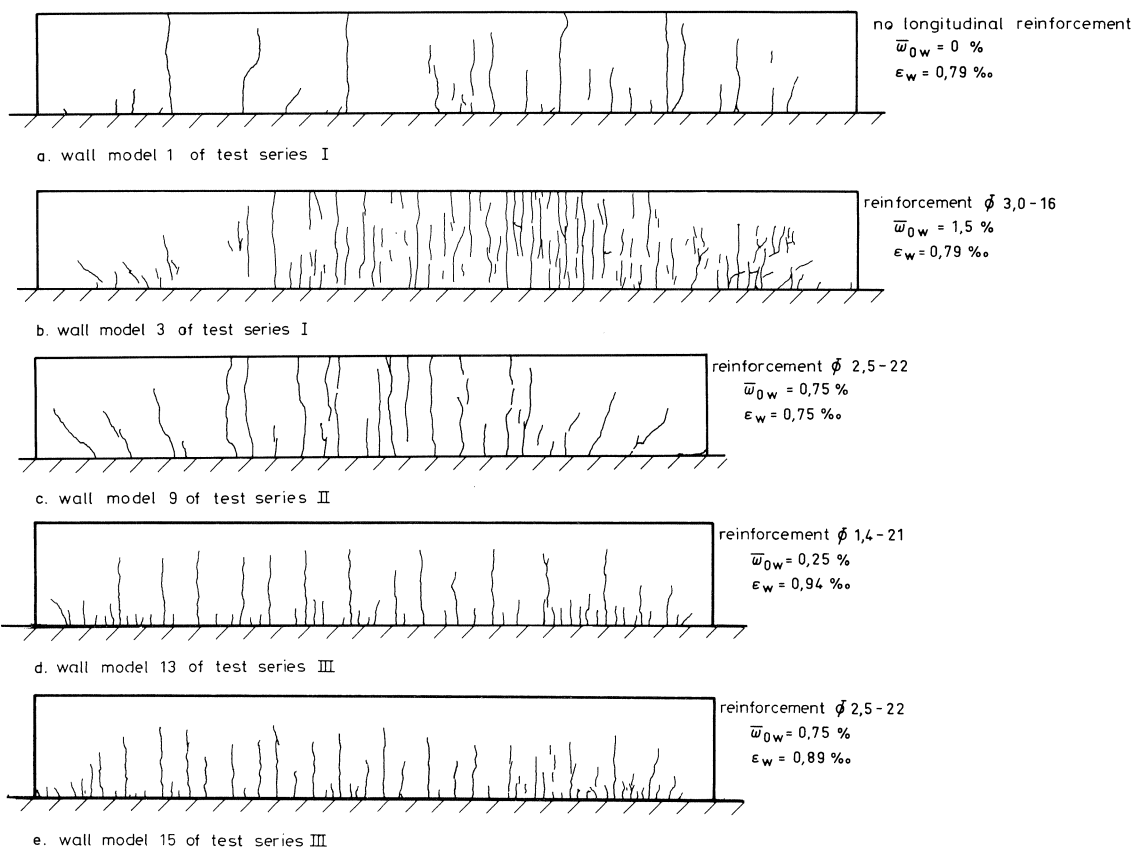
Crack patterns of some wall models after complete release of the prestress in the steel section.
